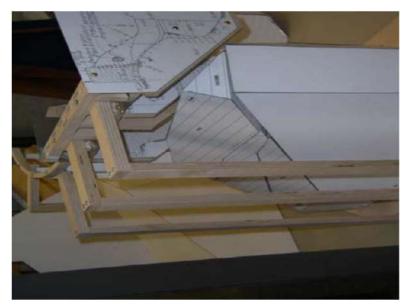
Nested foundation blocks, view from upstream (Reclamation)
